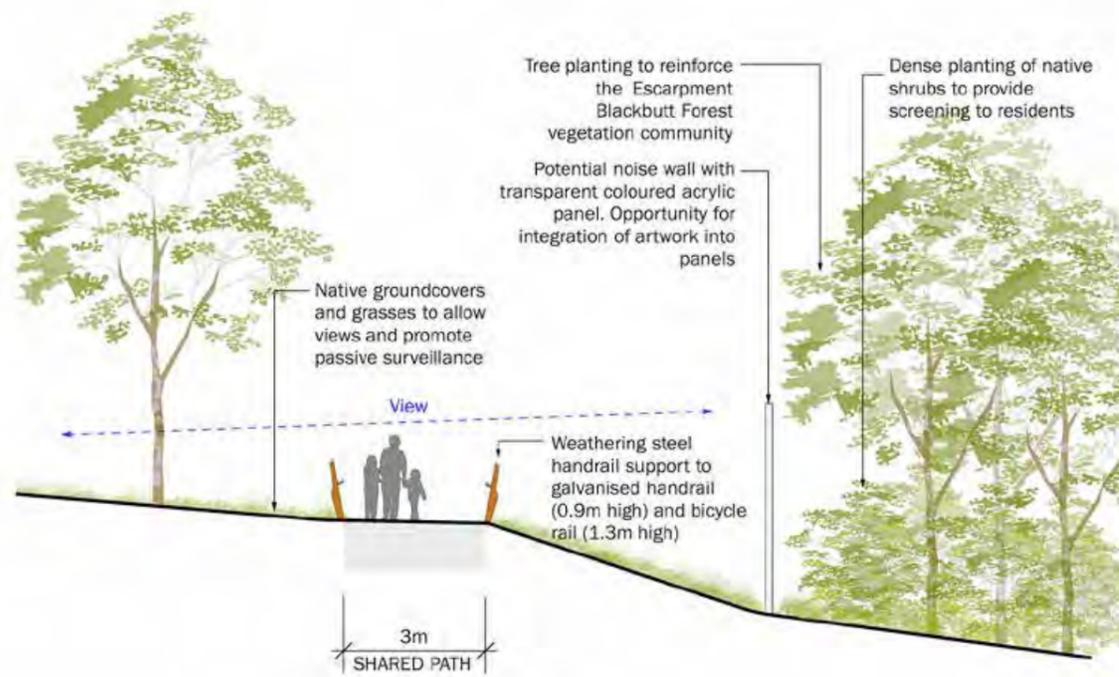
Section through proposed shared path to the south of the pedestrian bridge over Mount Ousley Road (Scale 1:150)
